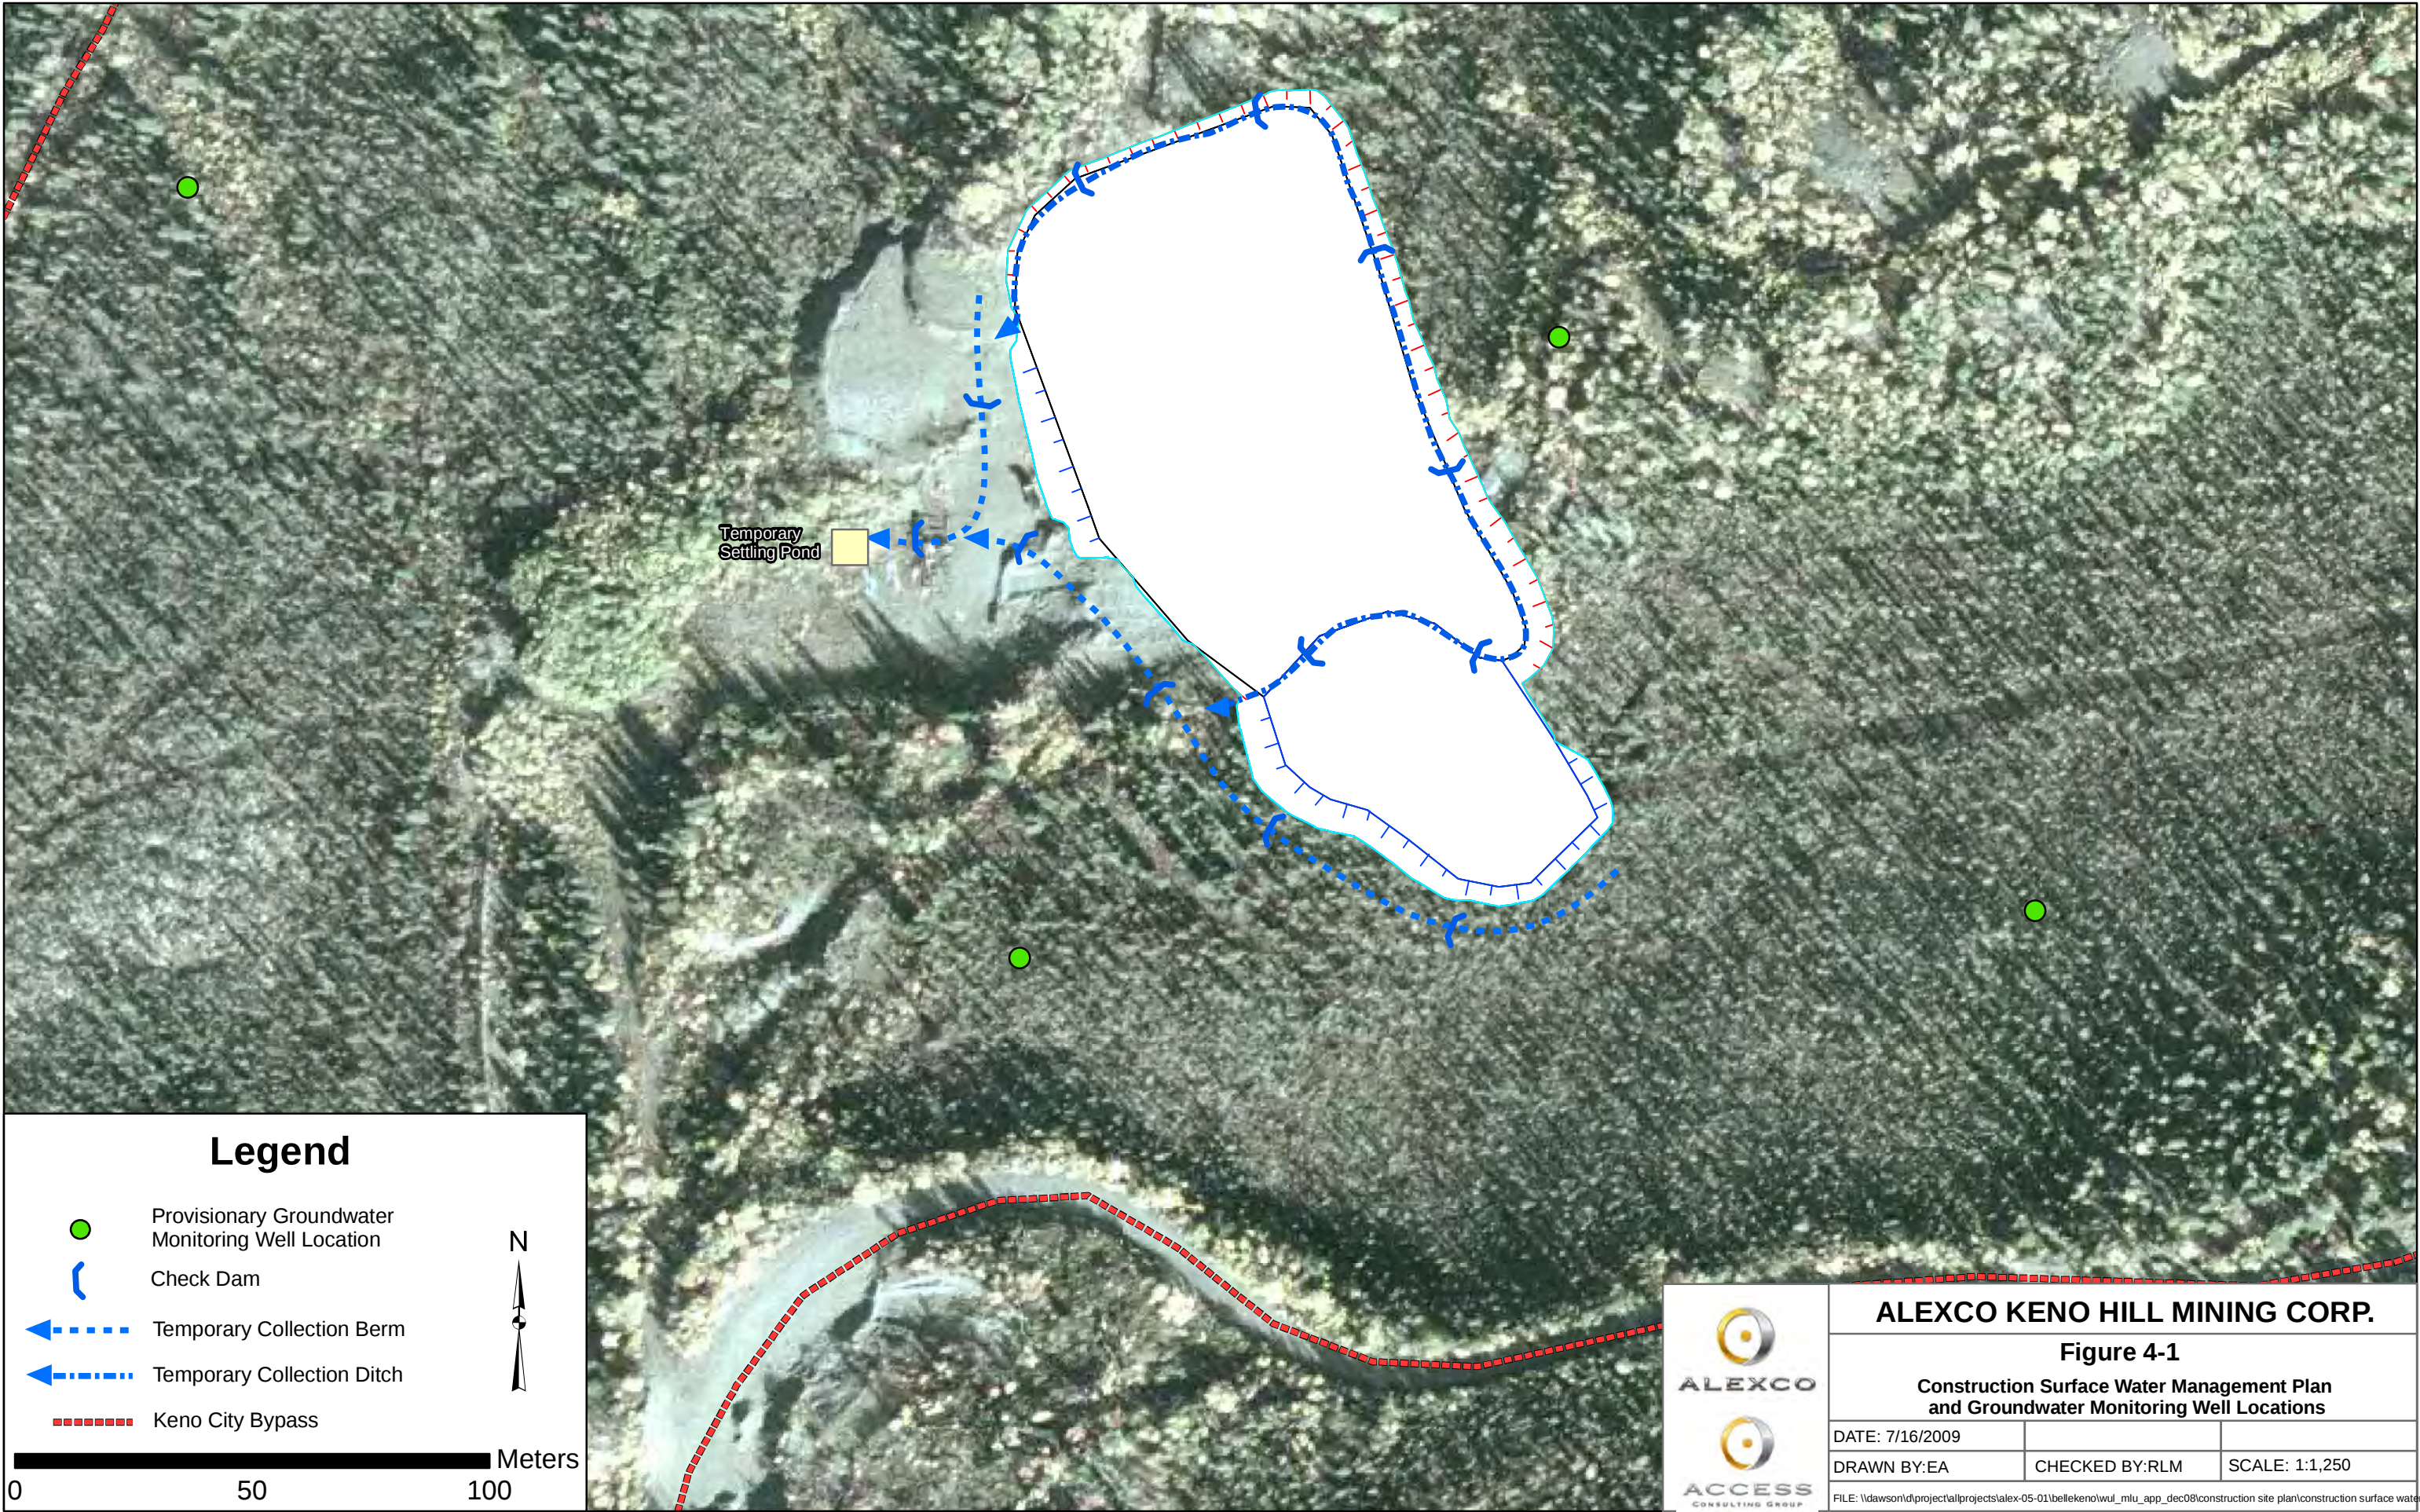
shows how surface runoff will be directed and stored and at the mine site. Surface water management plans which will be implemented during construction are outlined below.
